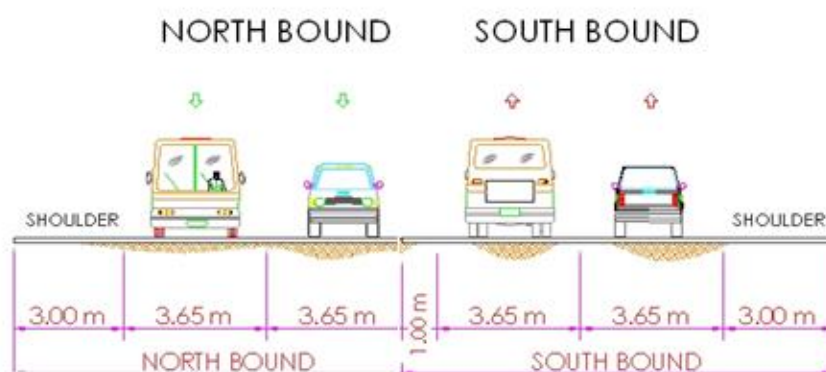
Existing Configuration of Daang Maharlika prior to TR4 Construction
